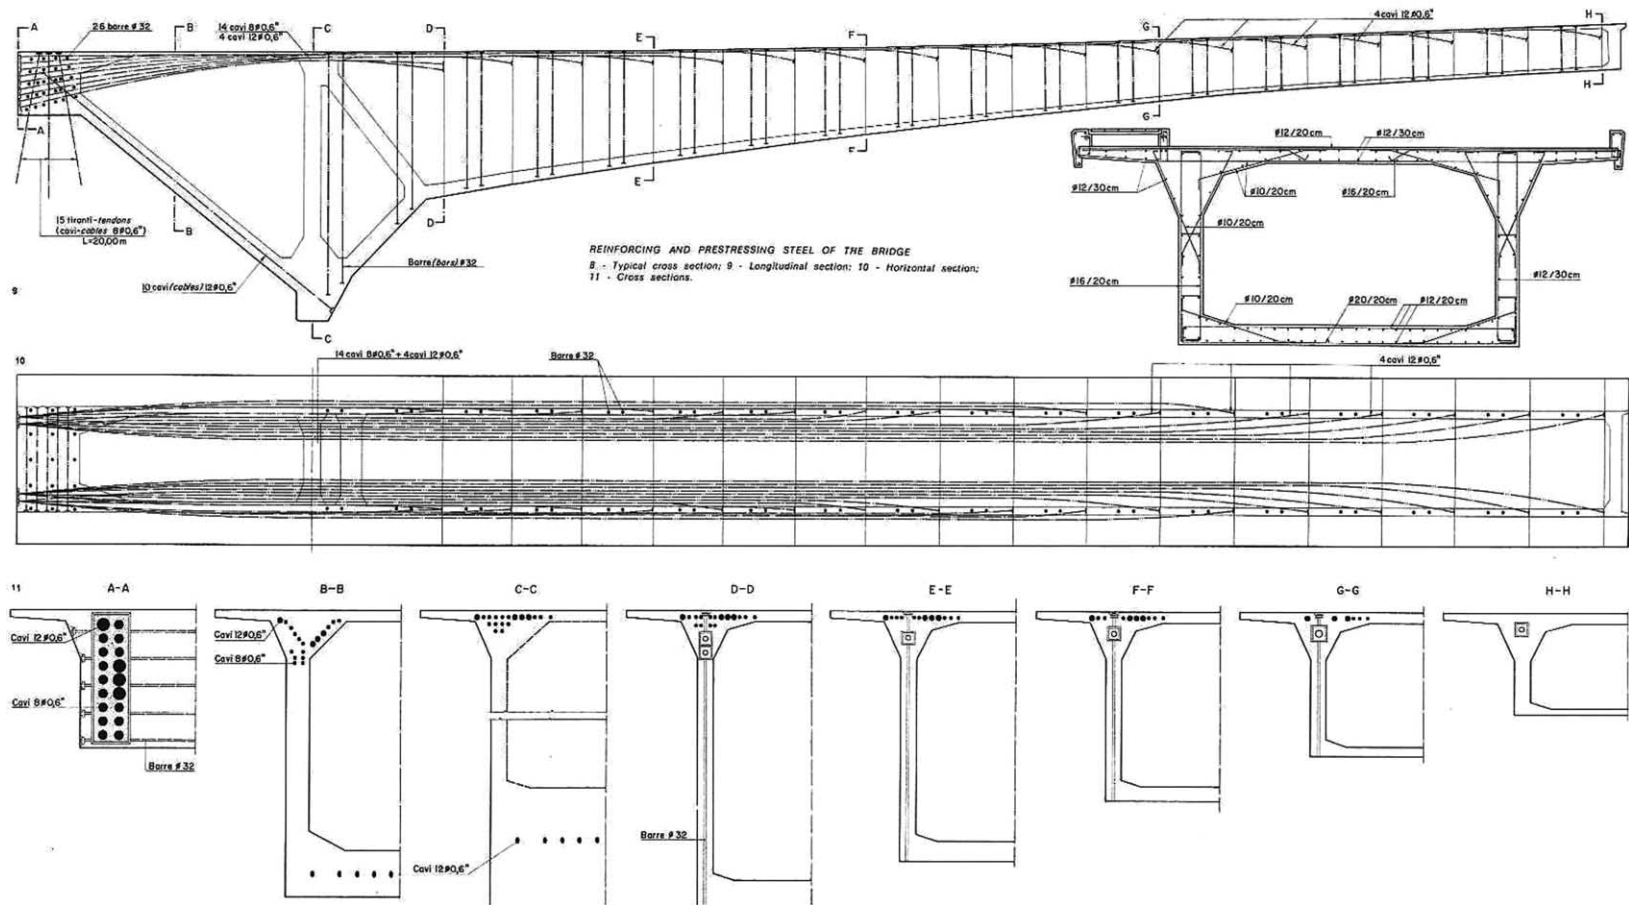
Layout of the prestressing cables and some details about the distribution of the main reinforcement bars (reprinted with permission from *L'industria Italiana del Cemento*—[7]).
